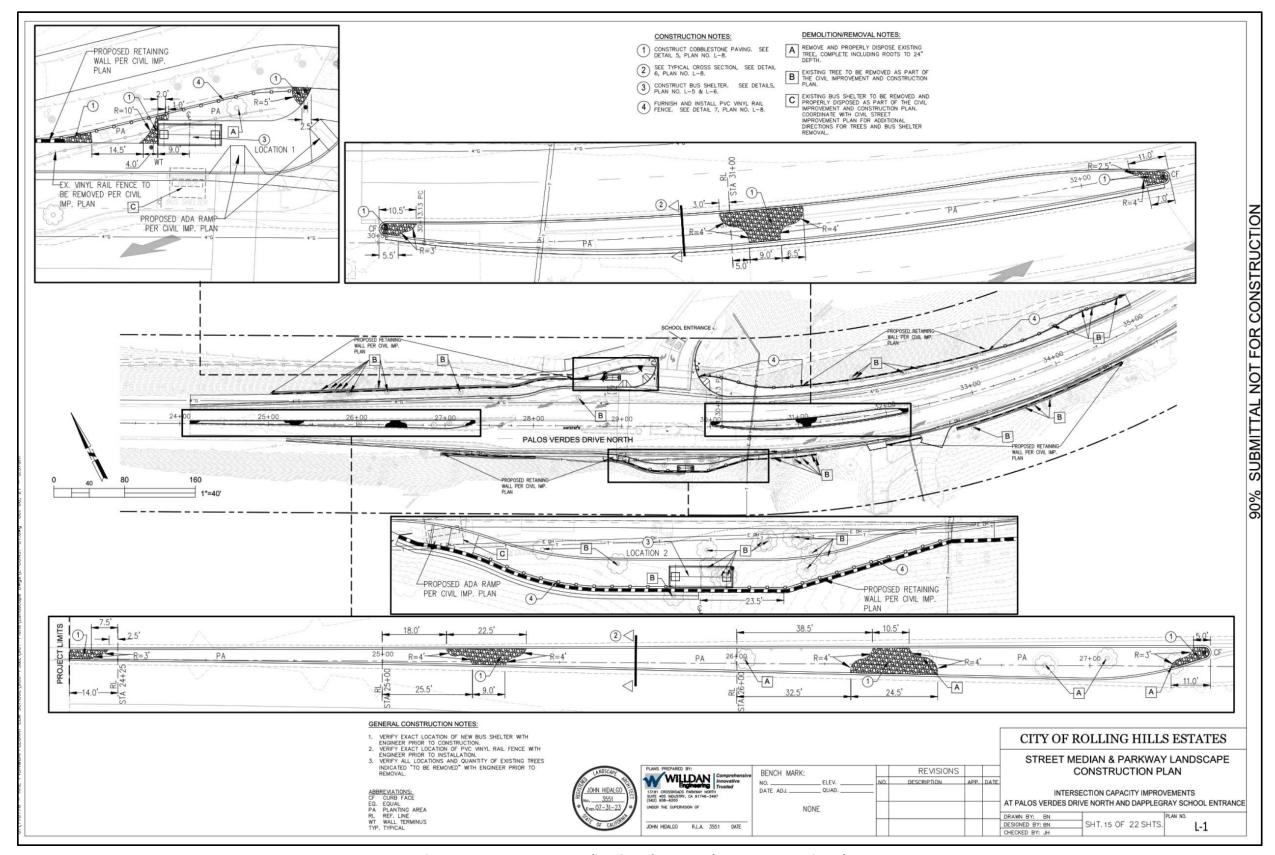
Street Median & Parkway Landscape Construction Plan
